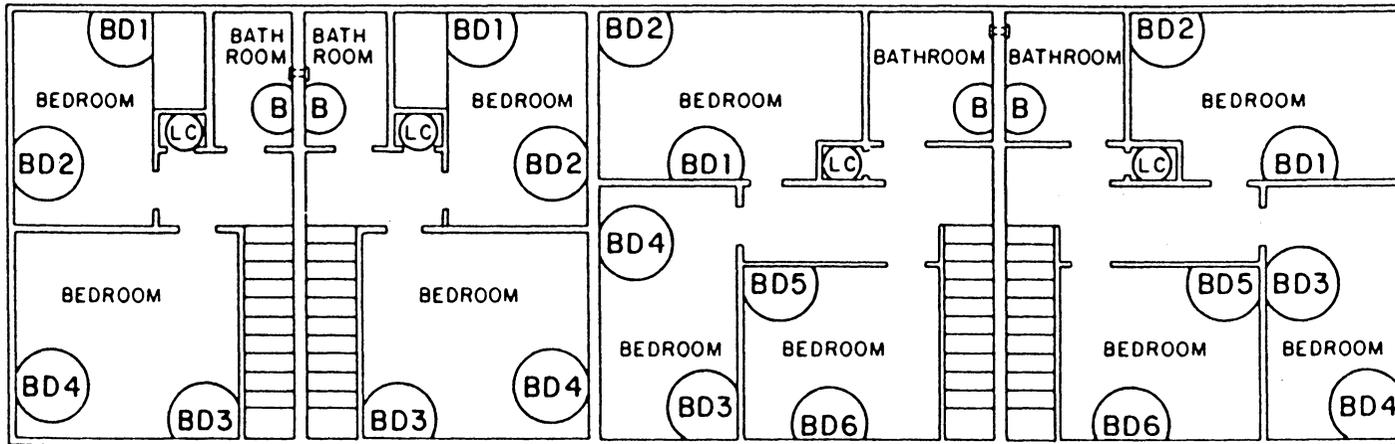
Diagram of the second floor of Building One showing trap locations and plumbing between apartments.
